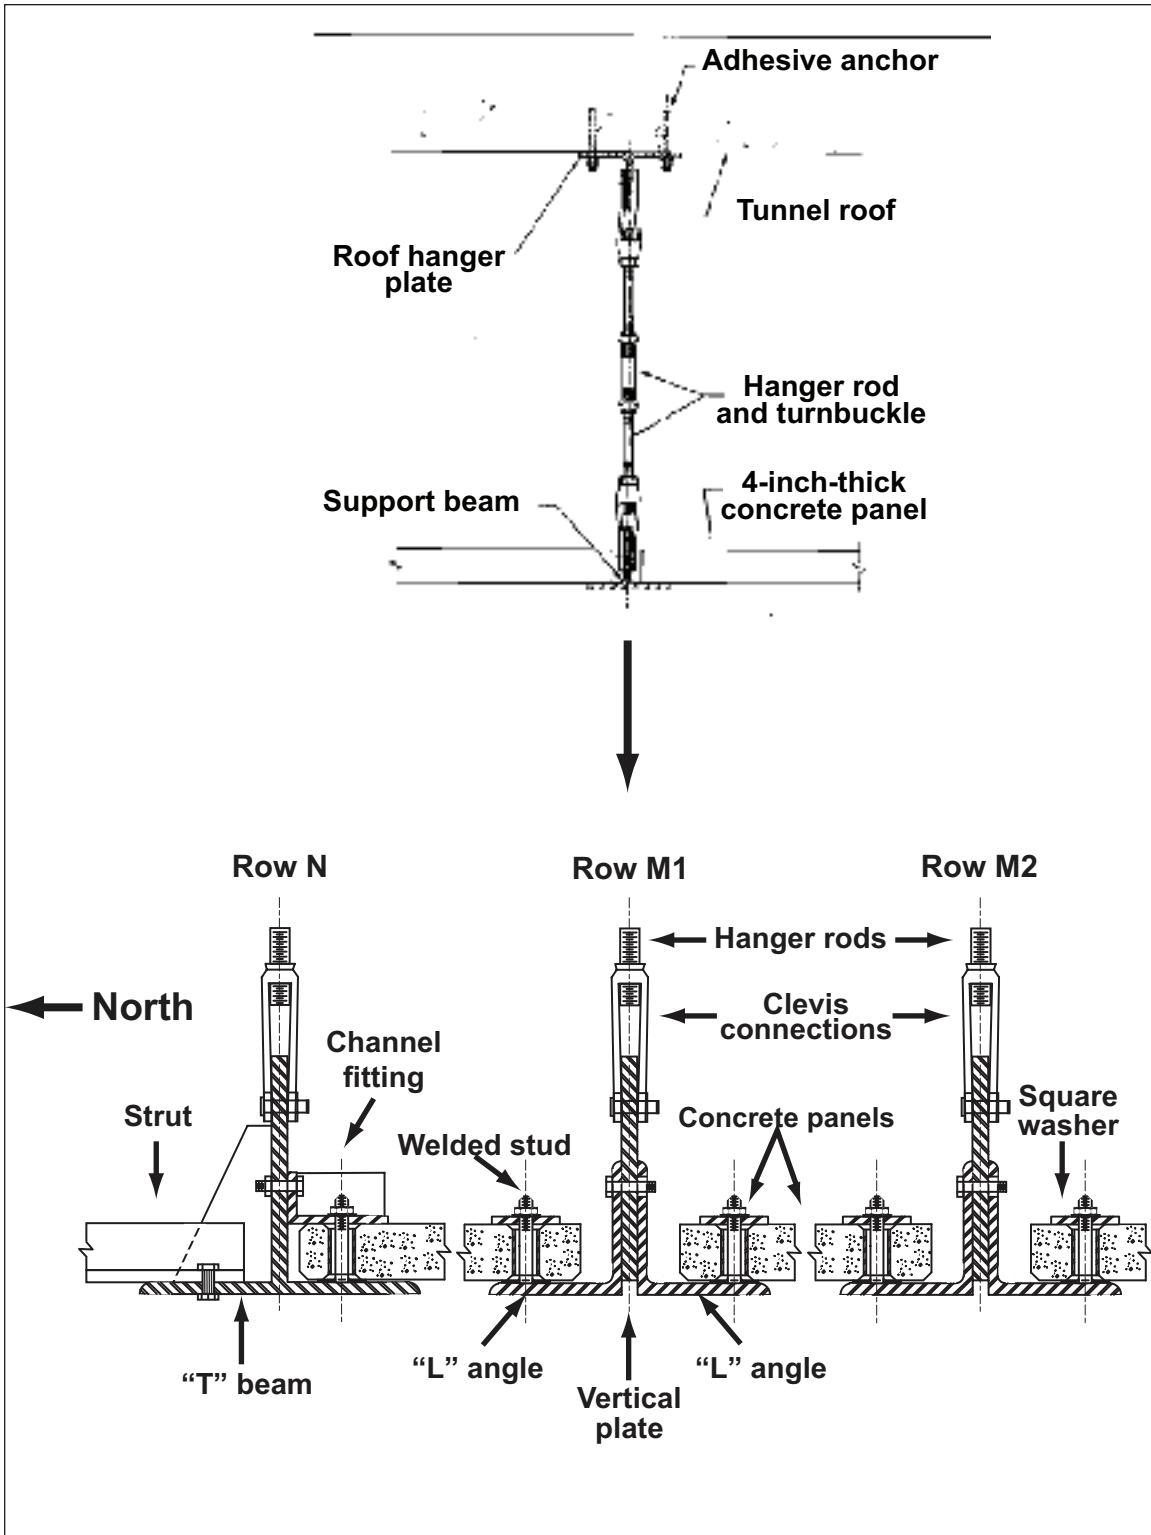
Cross section of the I-90 tunnel ceiling showing support beam and concrete panel connections (looking east, not to scale).
